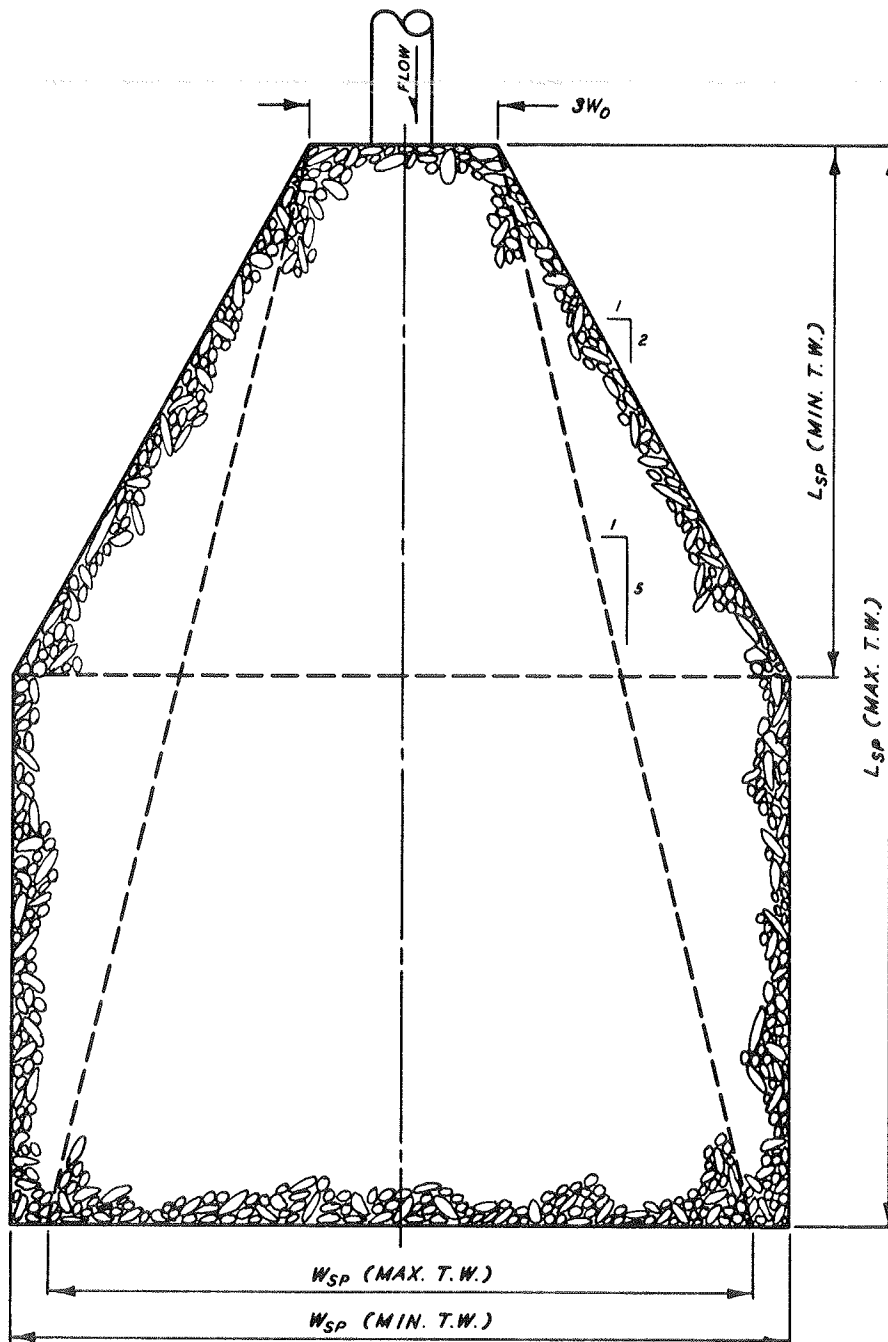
Recommended configuration of riprap blanket subject to minimum and maximum tailwaters
